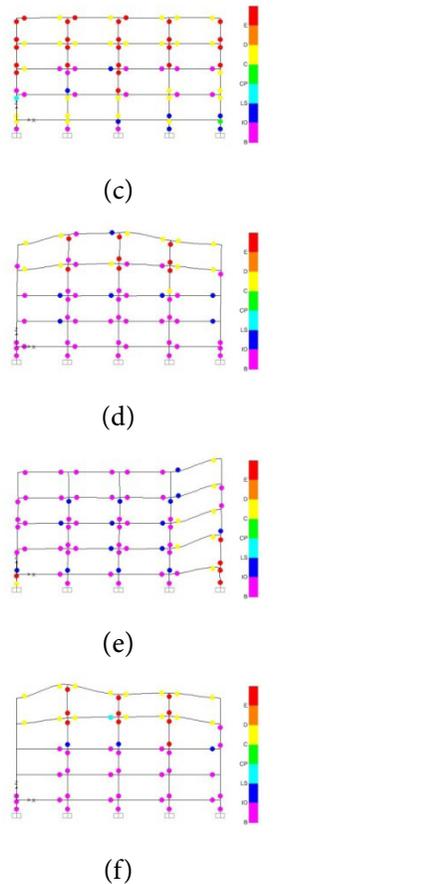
Hinge pattern of the Zone-IV structure at collapse.
